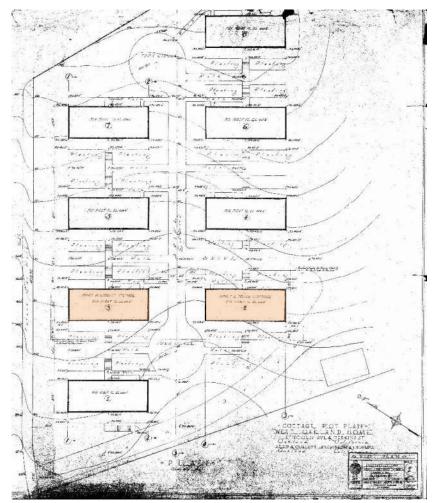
Proposed master plan for the Lincoln Avenue campus designed by Reed & Corlett, 1929. Building 1 (Mary A. Crocker Cottage) and Building 2 (Grace L. Trevor Cottage) are indicated by orange shading. Source: Permit A39344, Oakland Building Department.
